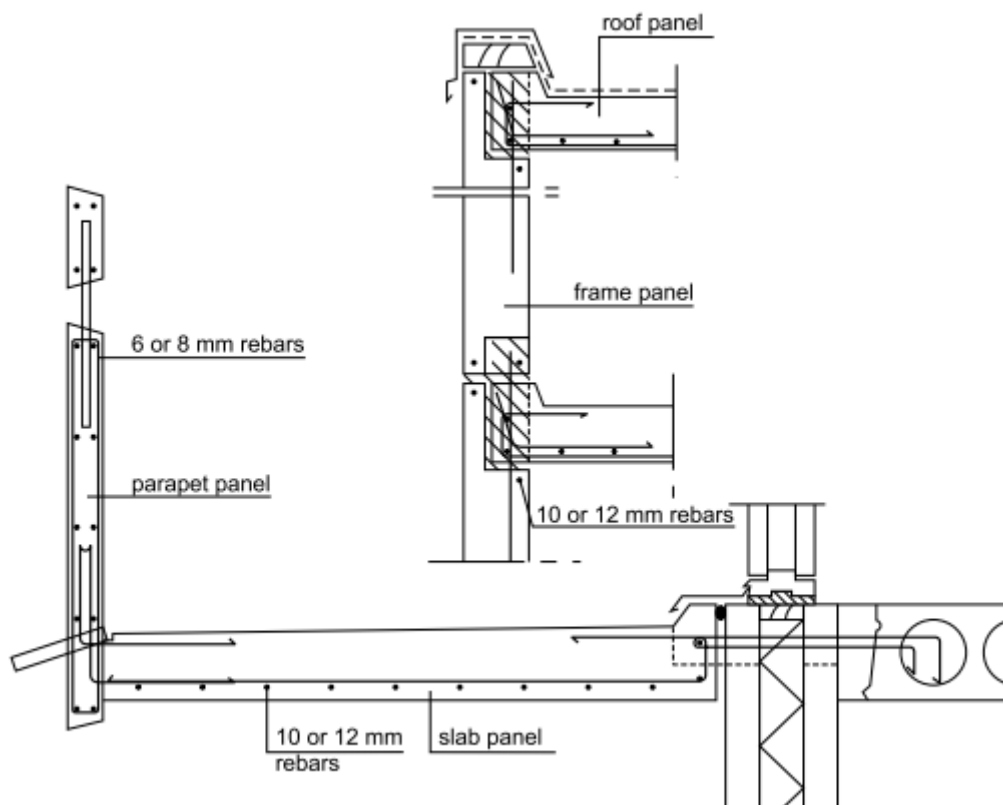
Cross-section of a typical Finnish balcony made of precast structural members (Pentti 1994).
